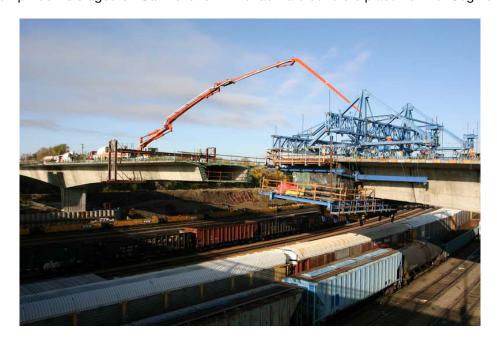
Cantilever 4 WB Segmental Construction - October 22, 2009:
